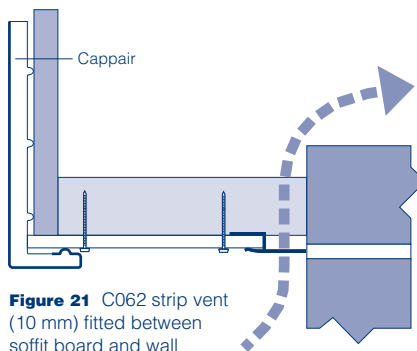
C062 strip vent (10 mm) fitted between soffit board and wall
